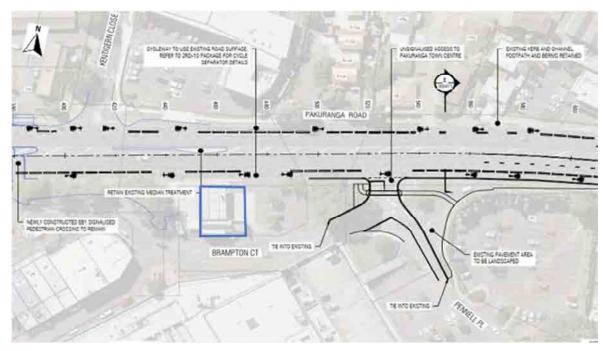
141 Pakuranga Road (blue outline) upon completion
